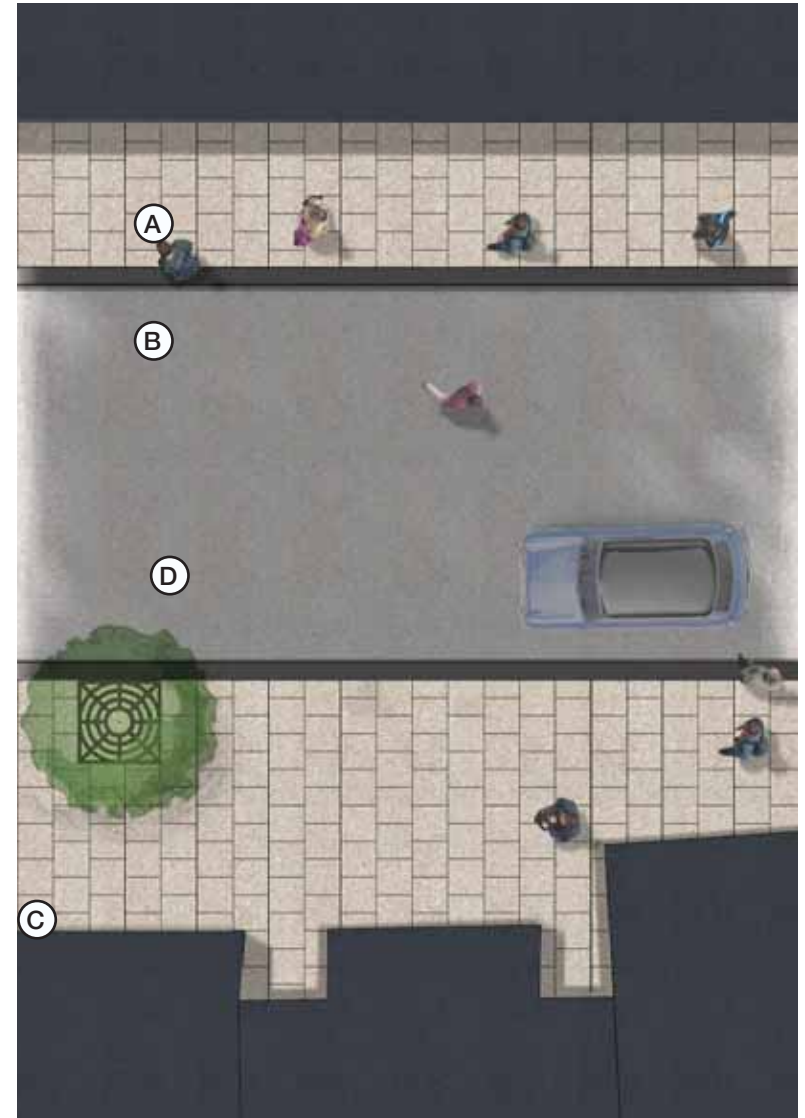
Concept sketch plan illustrating typical layout and materials of the street (Example Railway Street between South Street and Bircherley Green)
